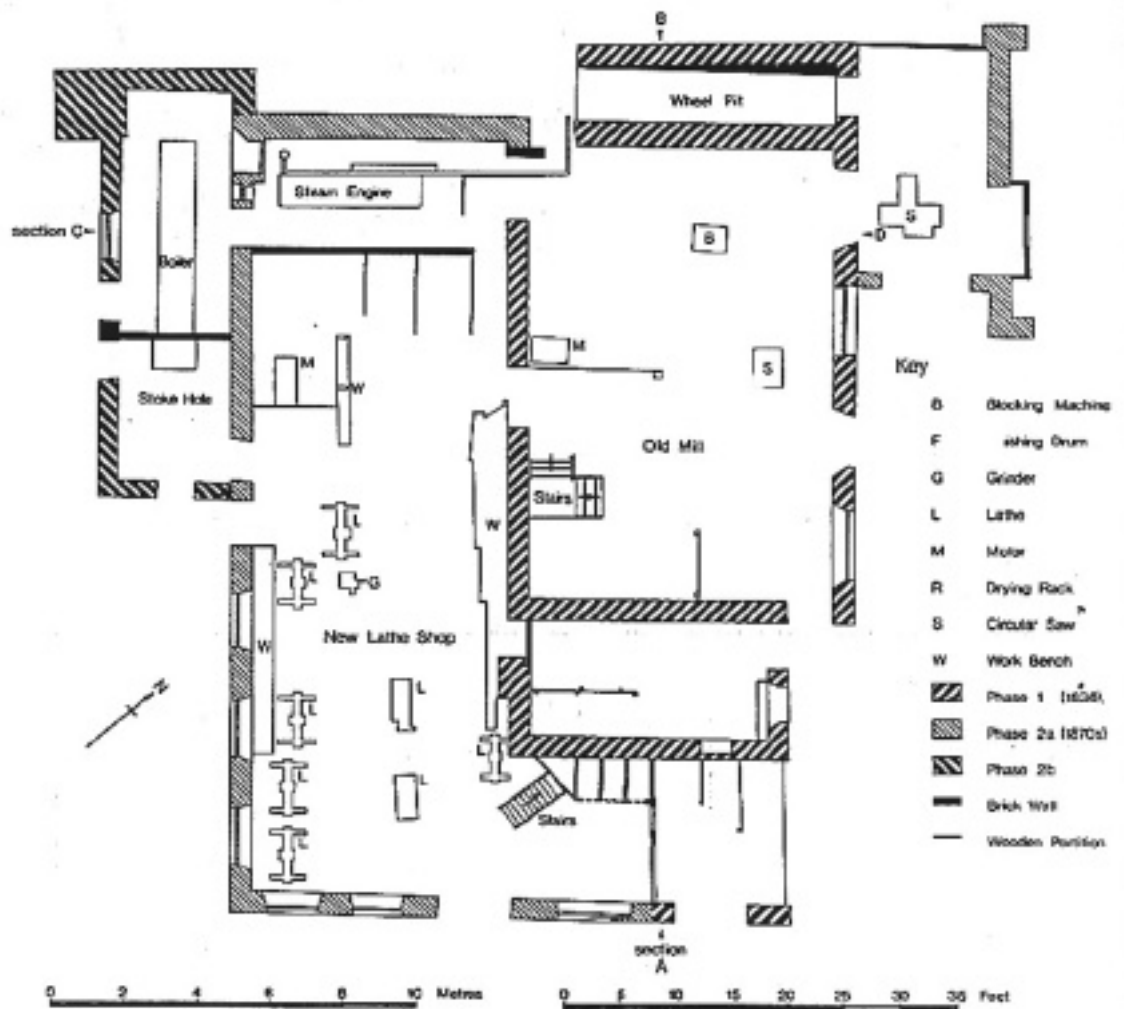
Plan of Stott Park bobbin mill. From White (1977:339)
